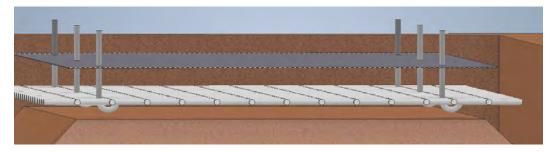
Rebar, Steel Mesh, and Anchor Bolt Placement
